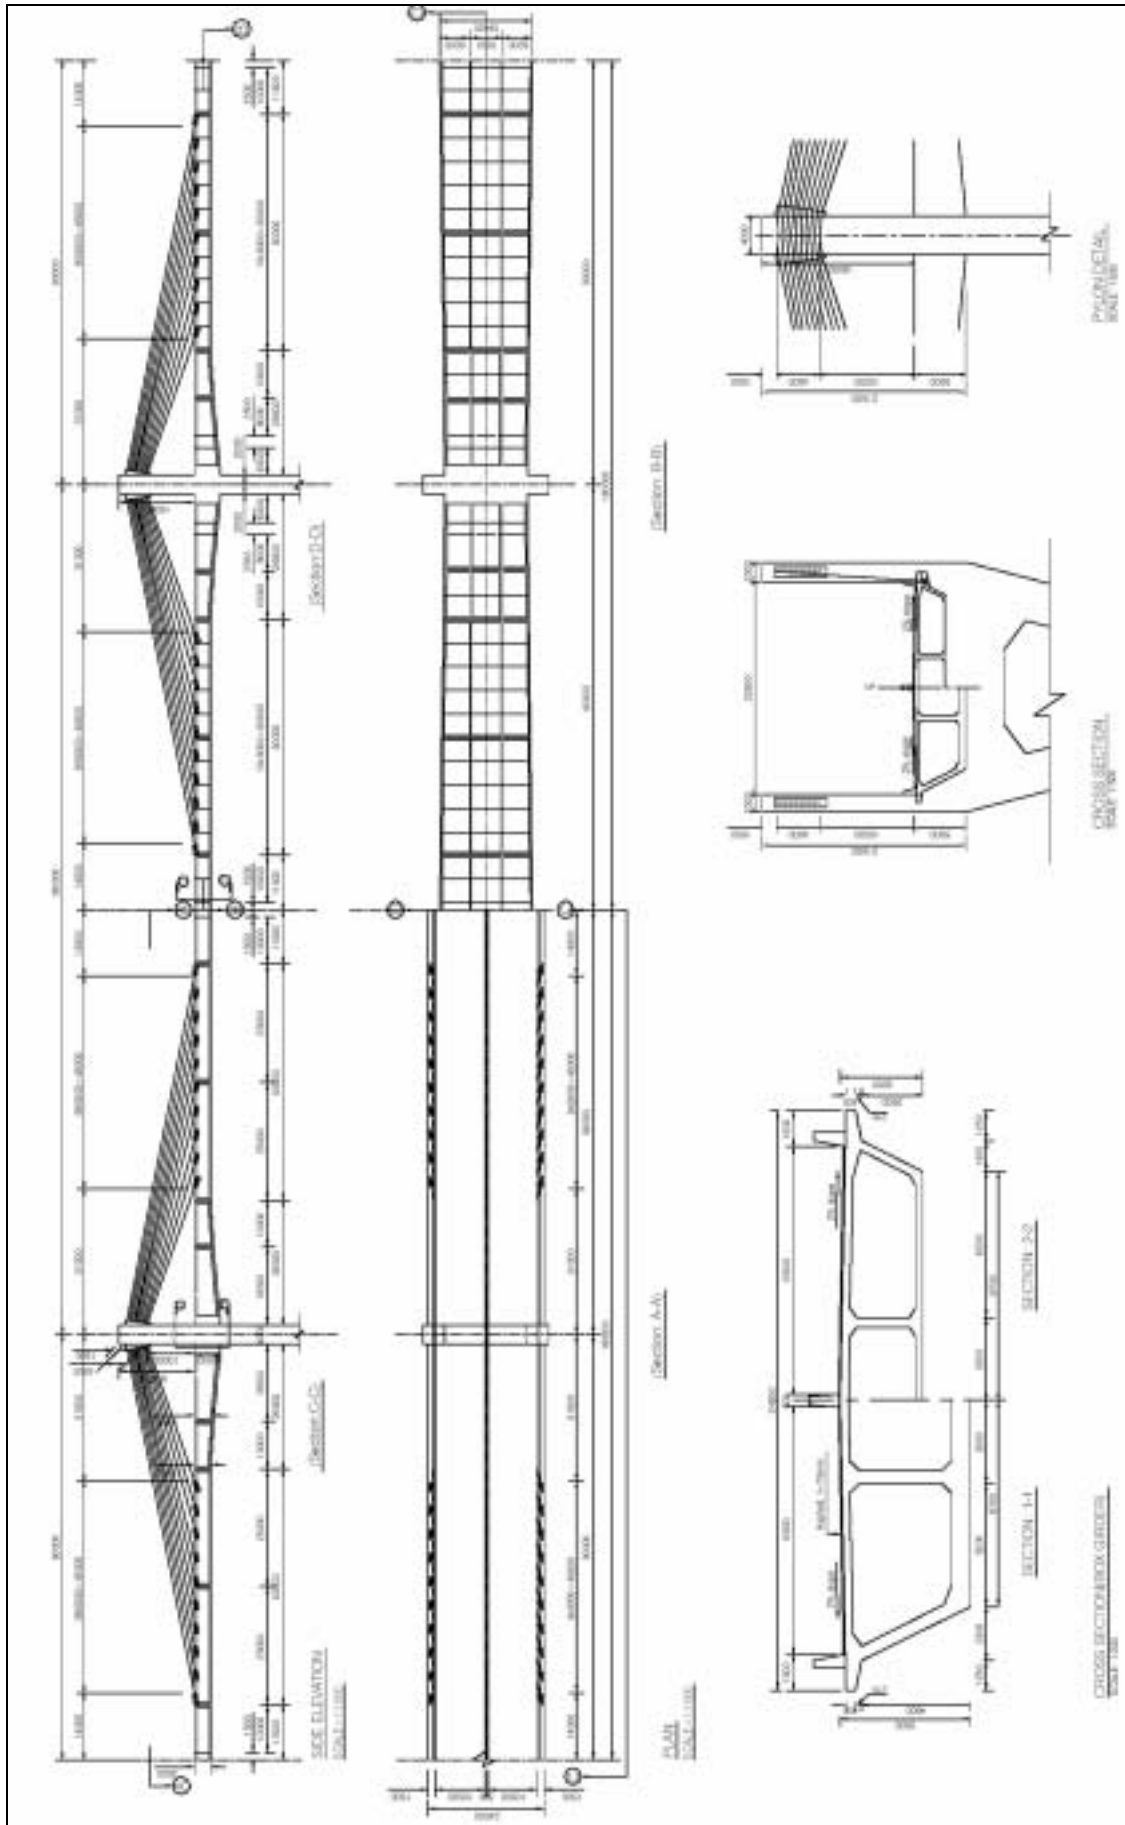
General View of the Extradosed Bridge for the Base Case based on the Asian Highway Standard
